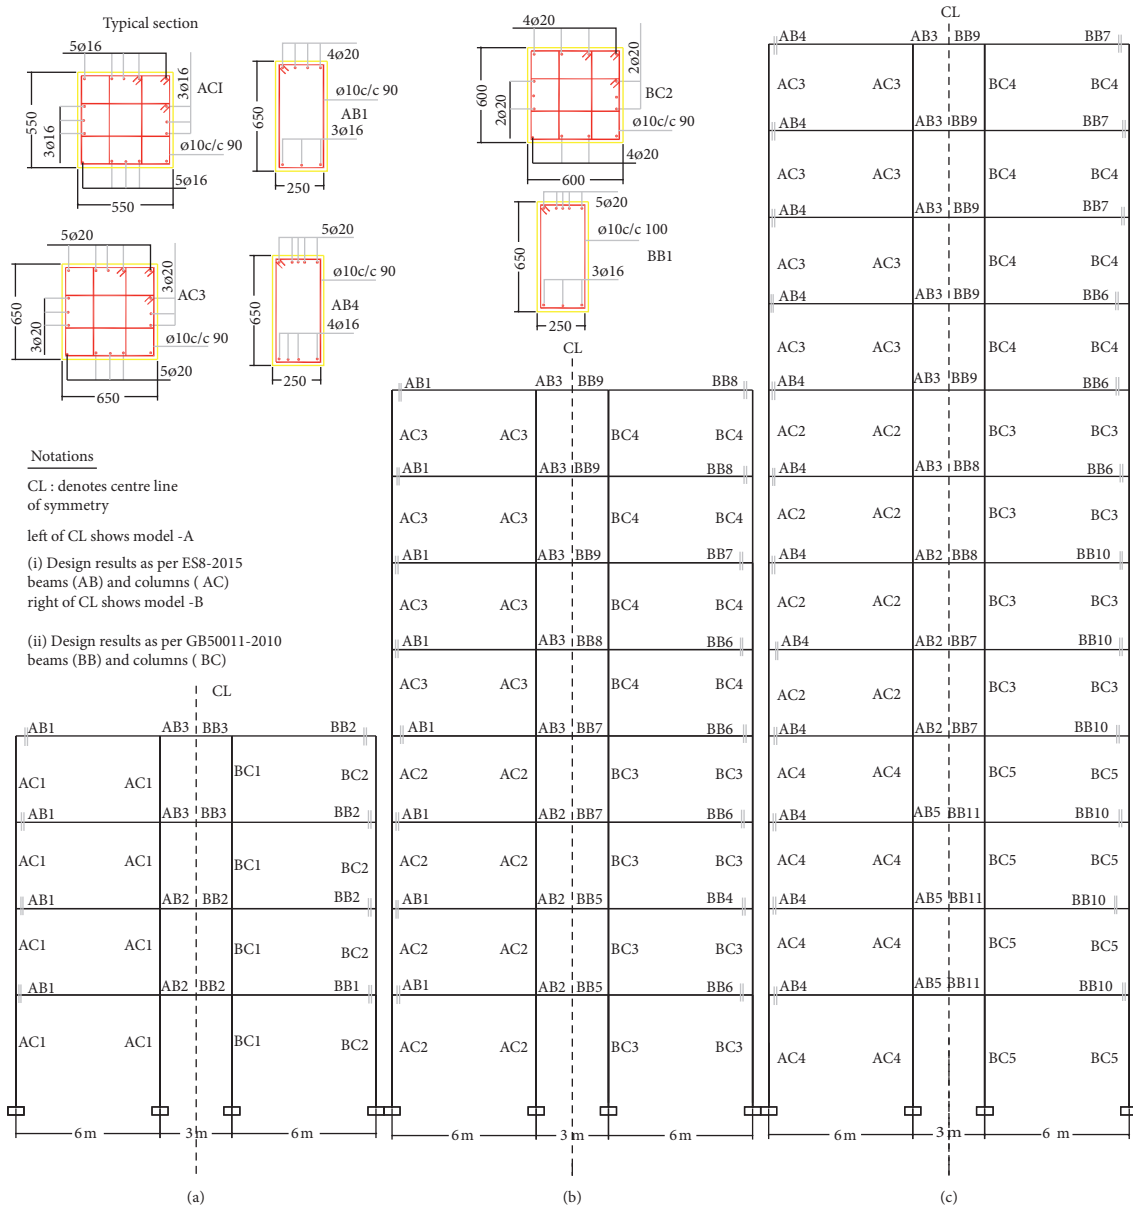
Reinforcement design diagram for (a) 4-, (b) 8-, and (c) 12-story RC frame designed as per ES8-15 and GB11-10.
